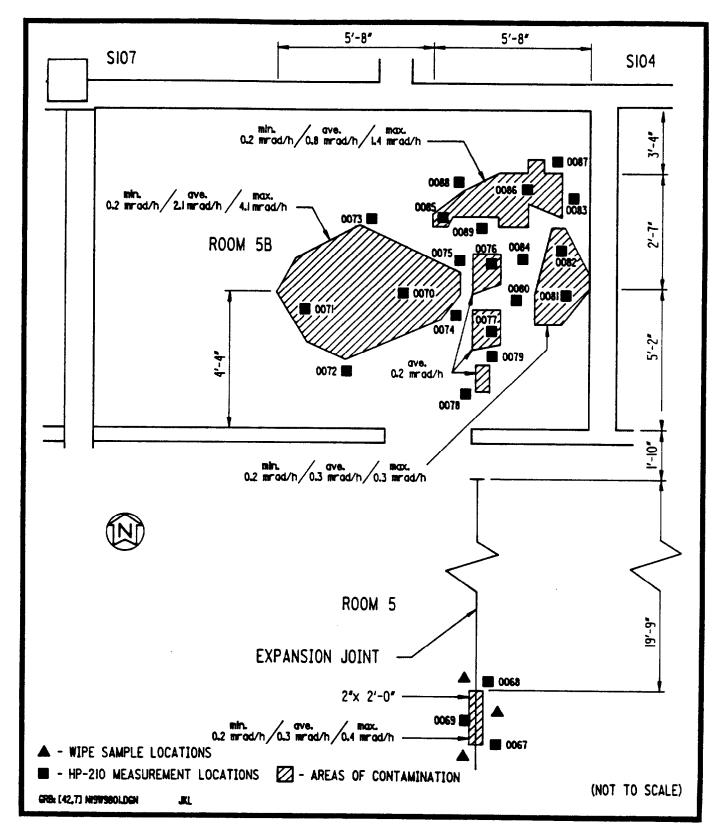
AREAS OF CONTAMINATION - ROOM 5B (FIRST FLOOR)
